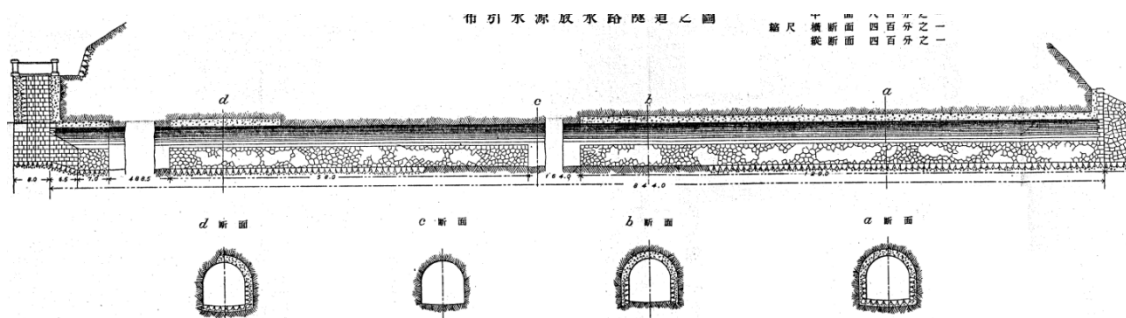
Cross Section of Nunobiki Sediment Bypass Tunnel
